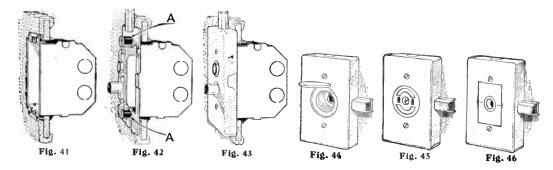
is a sectional view showing a standard flush switch box installed in a wall in the usual manner. Fig. 42 shows the No. 551 Plate and any standard push switch mounted over the box shown in Fig. 41. Fig. 43 shows the assembly of push switch outlet complete with a No. 561 Cover.
